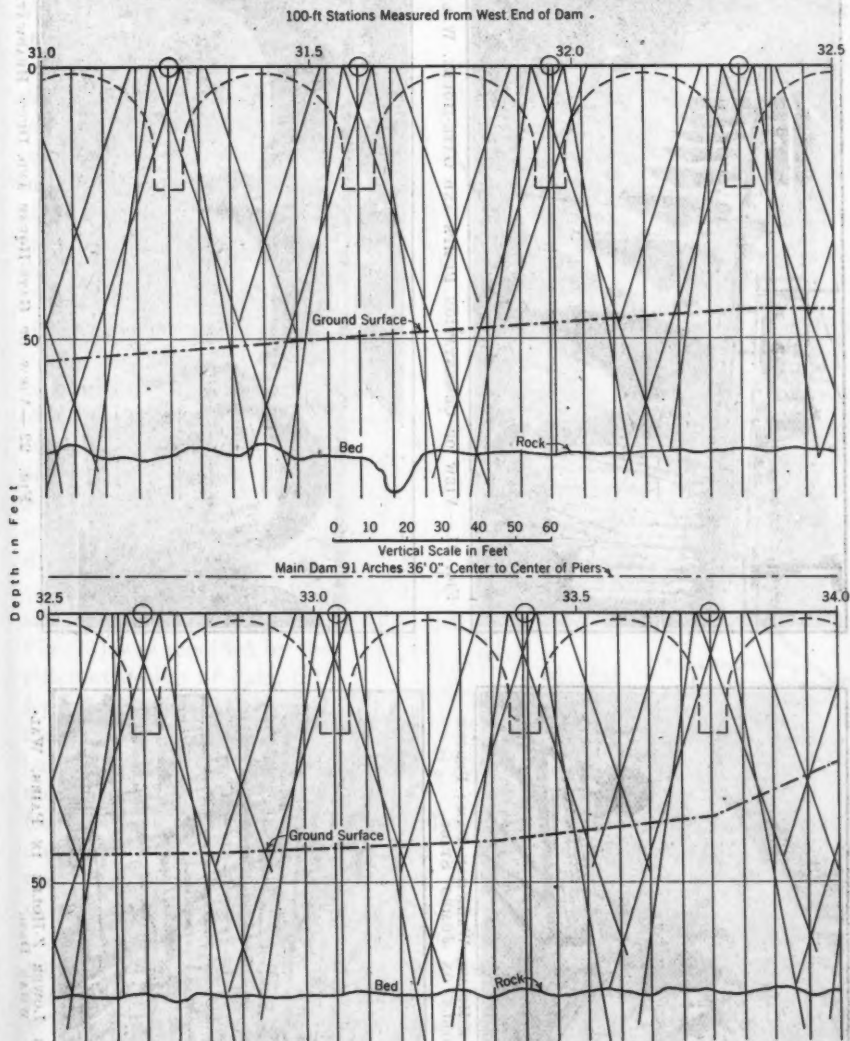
TYPICAL SPACING OF TOP BORINGS, WALWHAN DAM.
